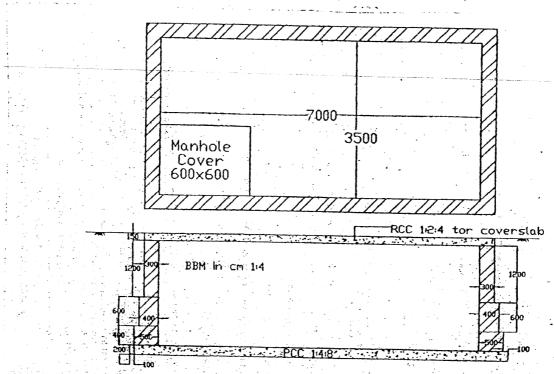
SKETCH OF SEPTIC TANK-PLAN AND SECTION
